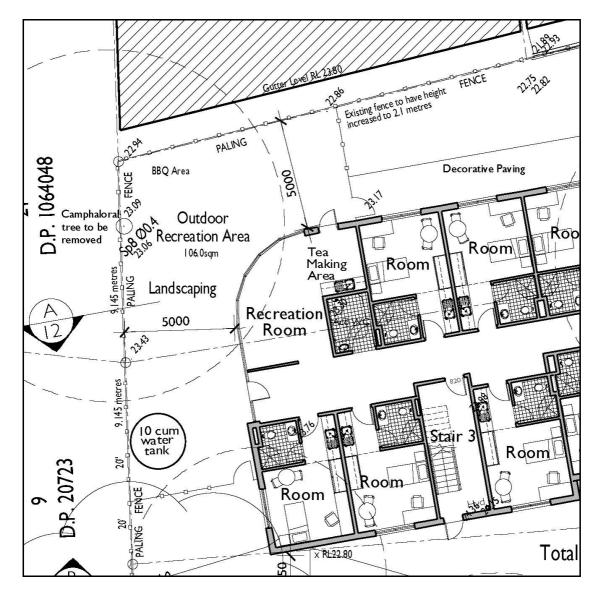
Portion of floor plan showing the location of and access to the outdoor recreation area.
